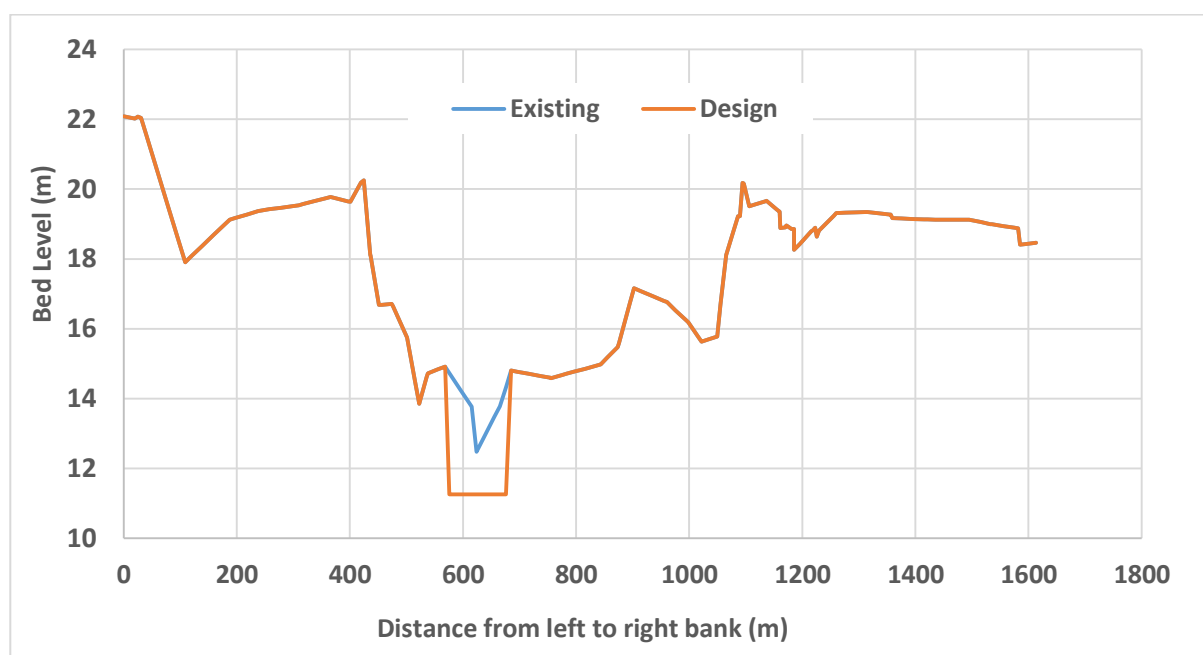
Typical cross-section of 100 m pilot channel with existing cross-section (chainage 995 m from Beguahana, river bed need to be dredged fully)
